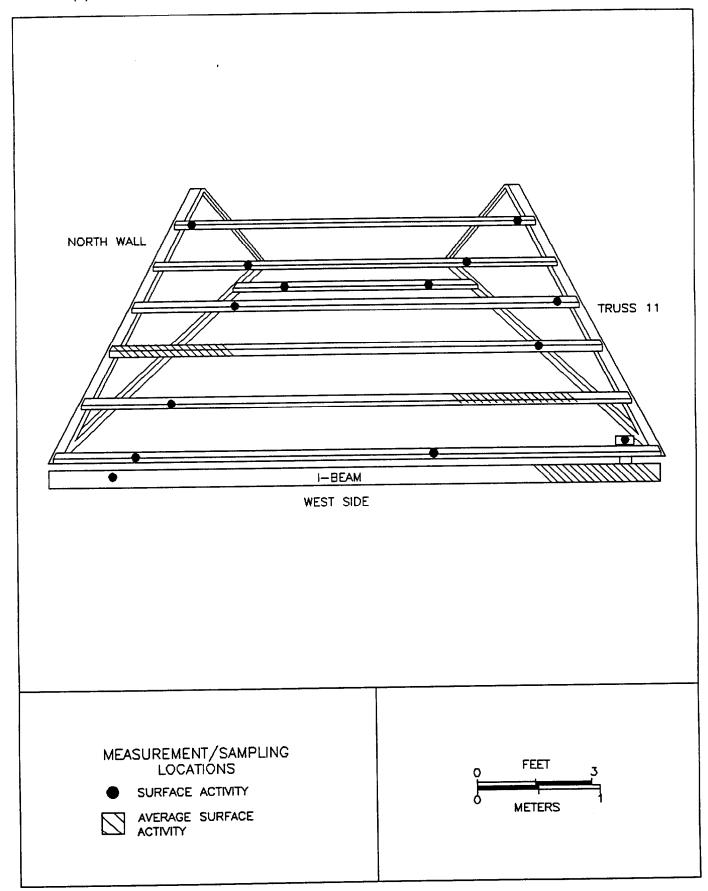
Building 3, Bay 11, West — Measurement and Sampling Locations
